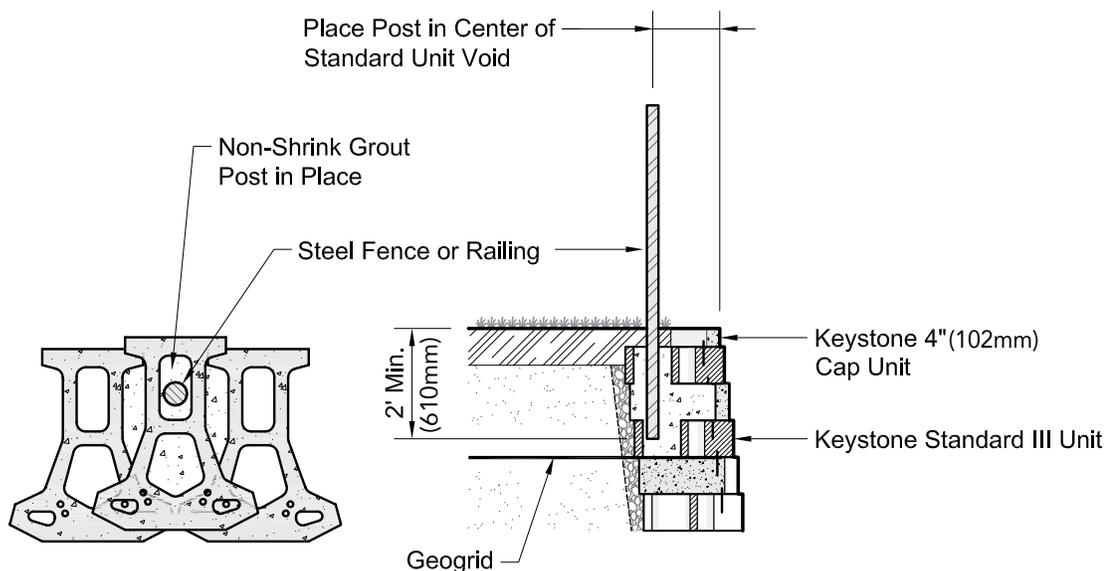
DIRECT MOUNT RAILING IN STANDARD UNIT WALL - 1" SETBACK
